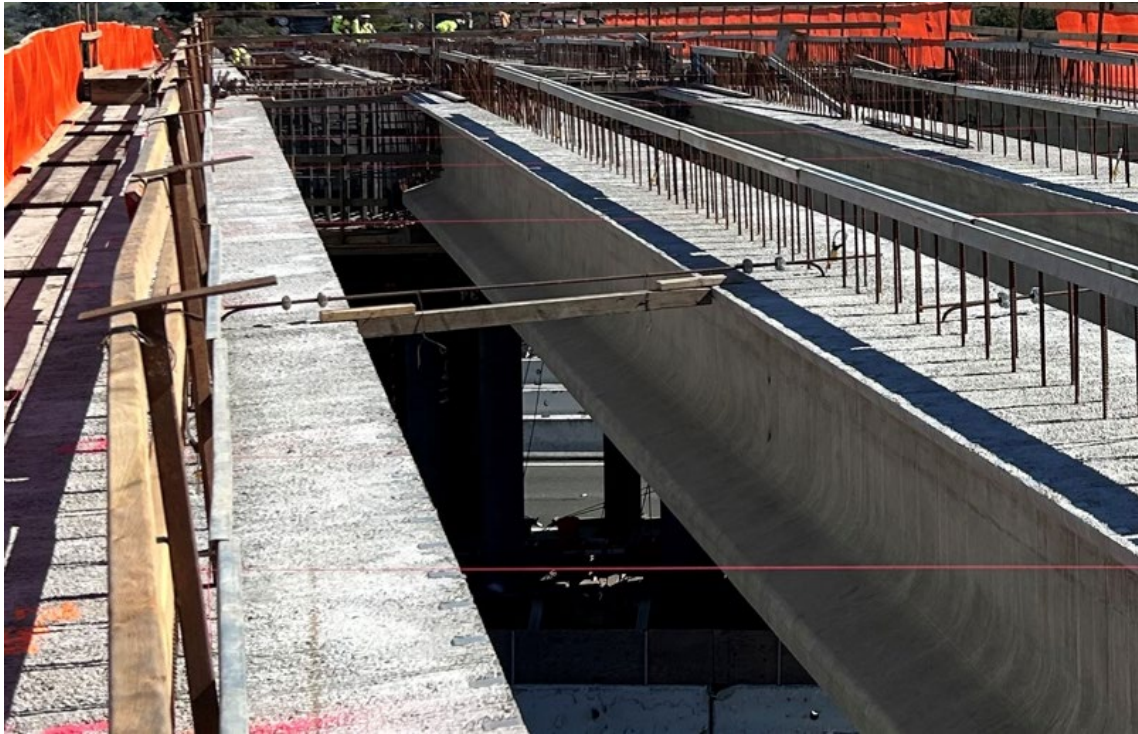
PC PS Girder Temporary Bracing Between Members
